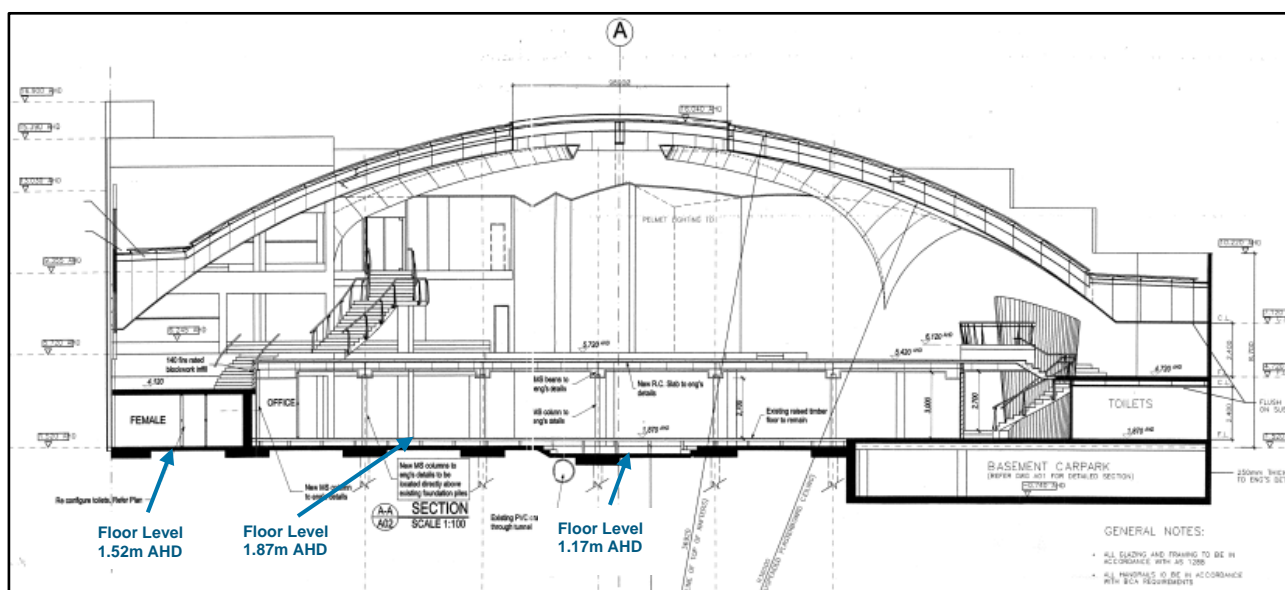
Cross-Section through the Hotel – Cross-Section (Enth Degree Architects, 2005)
